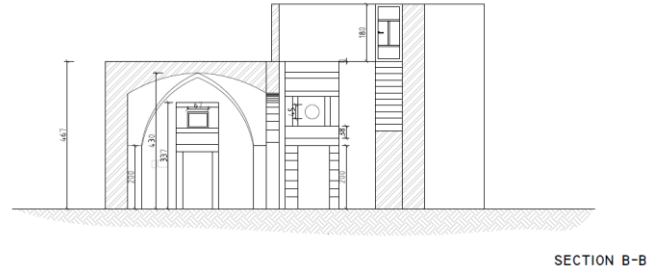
Al-Ashi house, section B-B. (Source: Iwan Centre, 2012)
